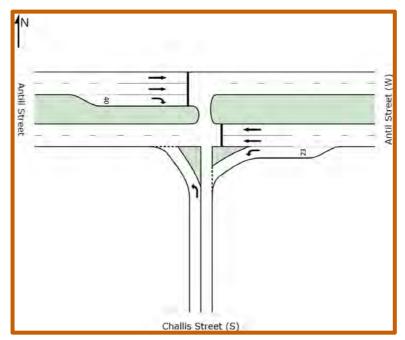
Recommended Layout for the Intersection of Antill Street and Challis Street
